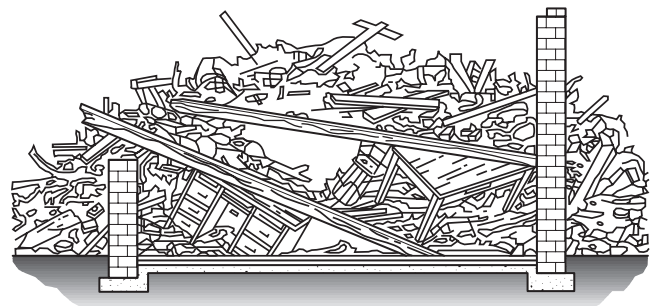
(f)(c) Pancake floor collapse. (Courtesy of U.S. Department of Civil Defense)
